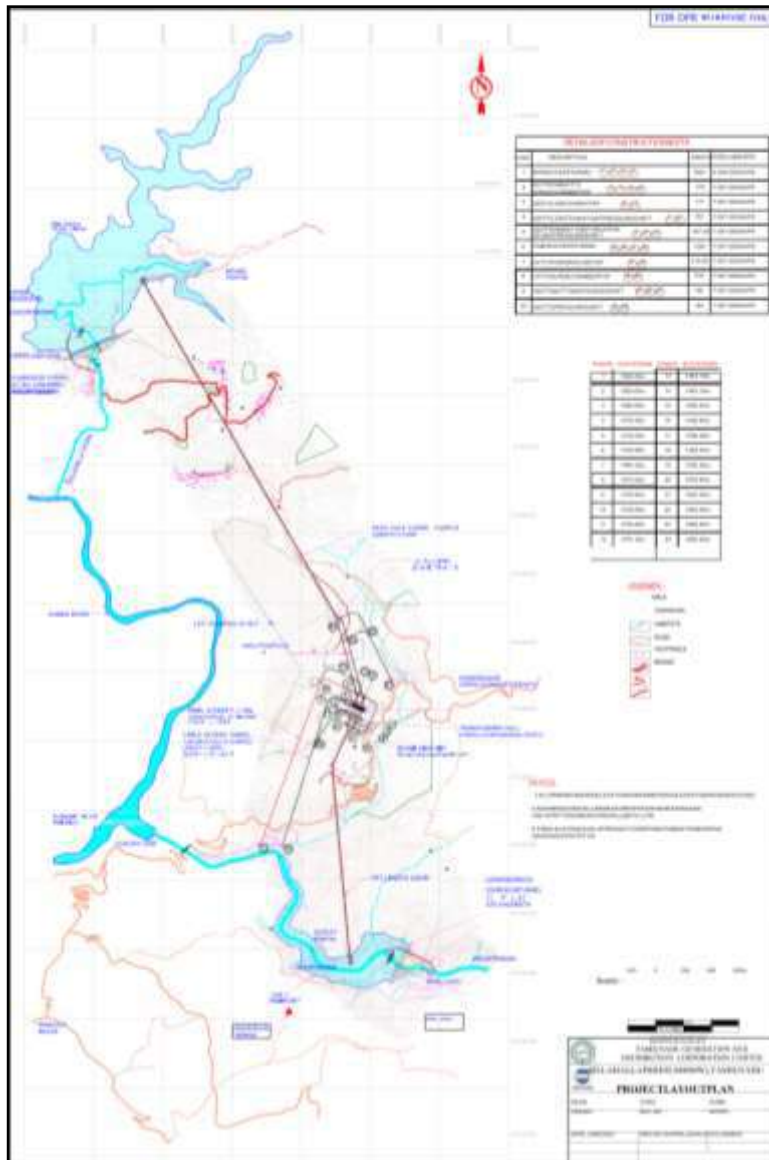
Project Layout of proposed Sillahalla PSHEP Stage-I
